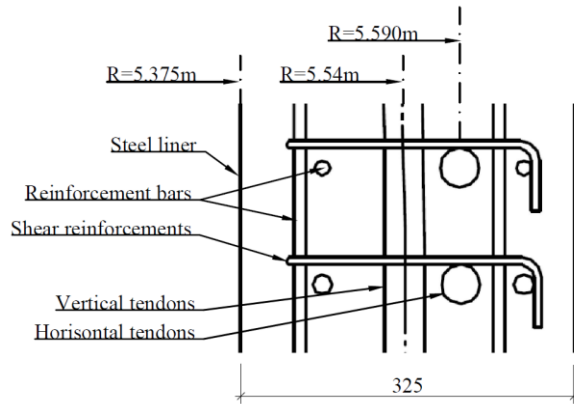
General arrangement of structural components in containment wall (vertical cross section).
